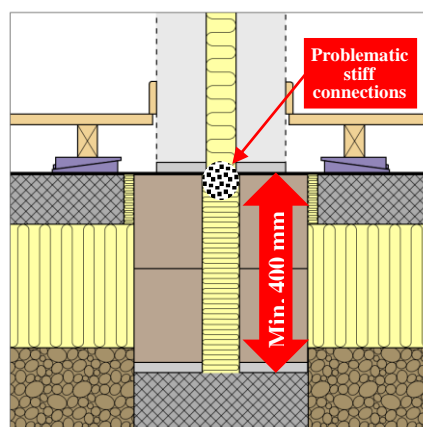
Vertical section showing a foundation/terrain floor assembly.
